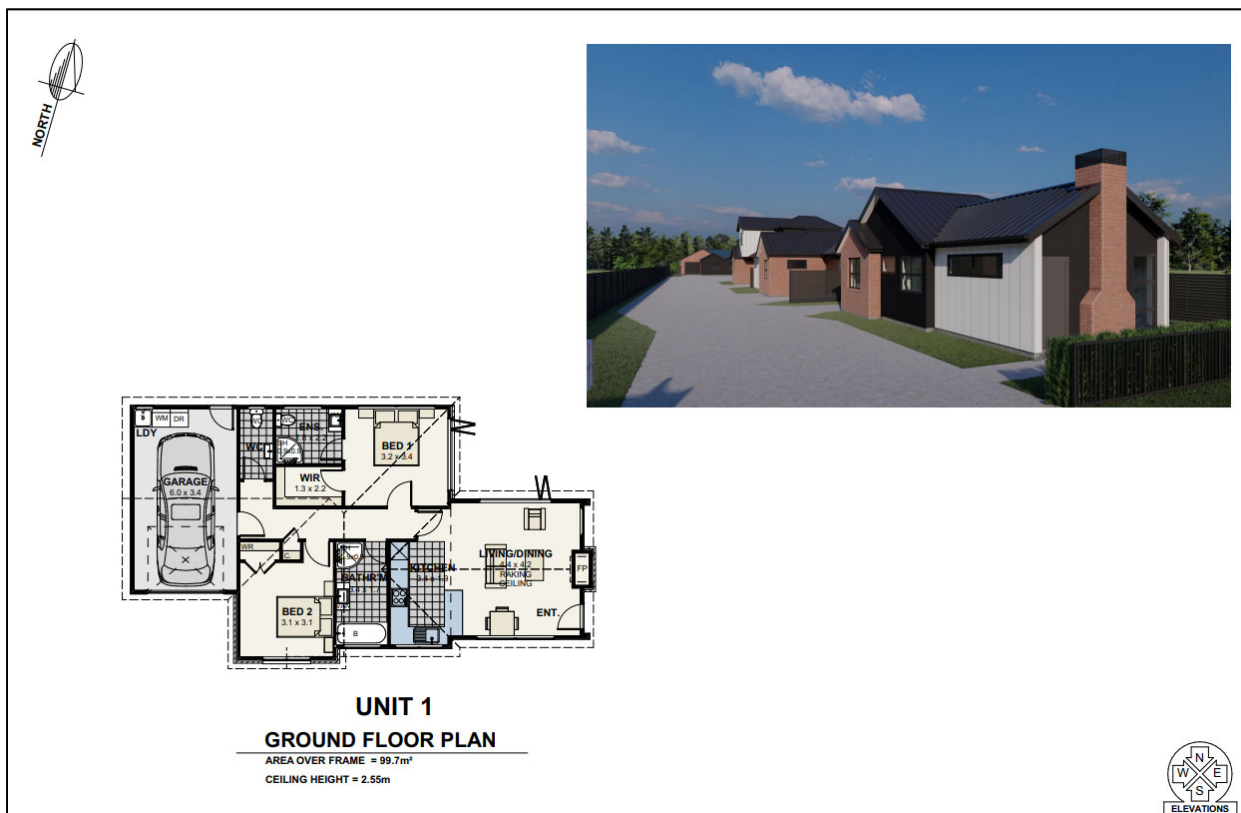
Floor plan for the dwelling on Lot 1, and perspective of the development looking west from Coleridge Street
